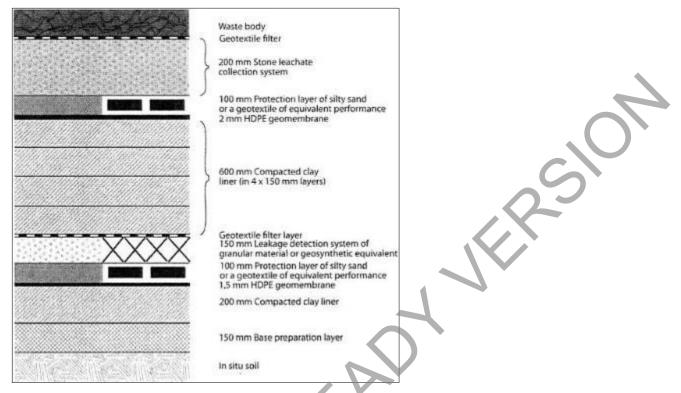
Minimum Engineering Design Requirements for Class A Landfill Site (South Africa, GN R. 636 norms and standards)
